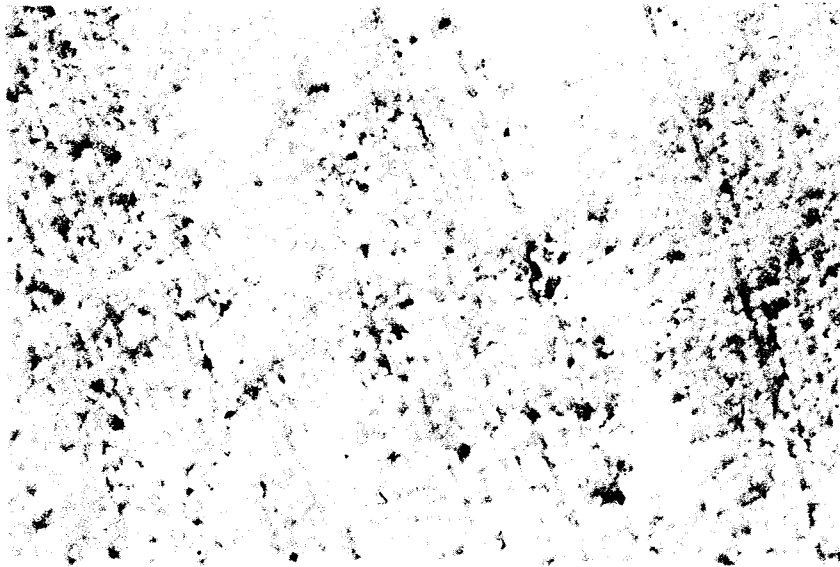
Test Section F-3: Longitudinal Broom Finish
